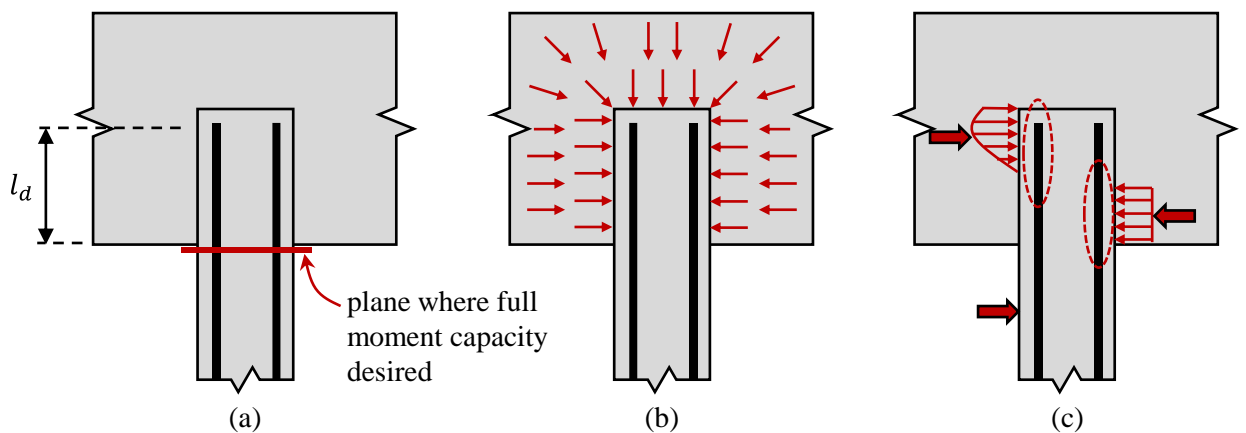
Strand development in embedded prestressed concrete pile: (a) Available development length and plane where full moment capacity is desired, (b) shrinkage of the footing
